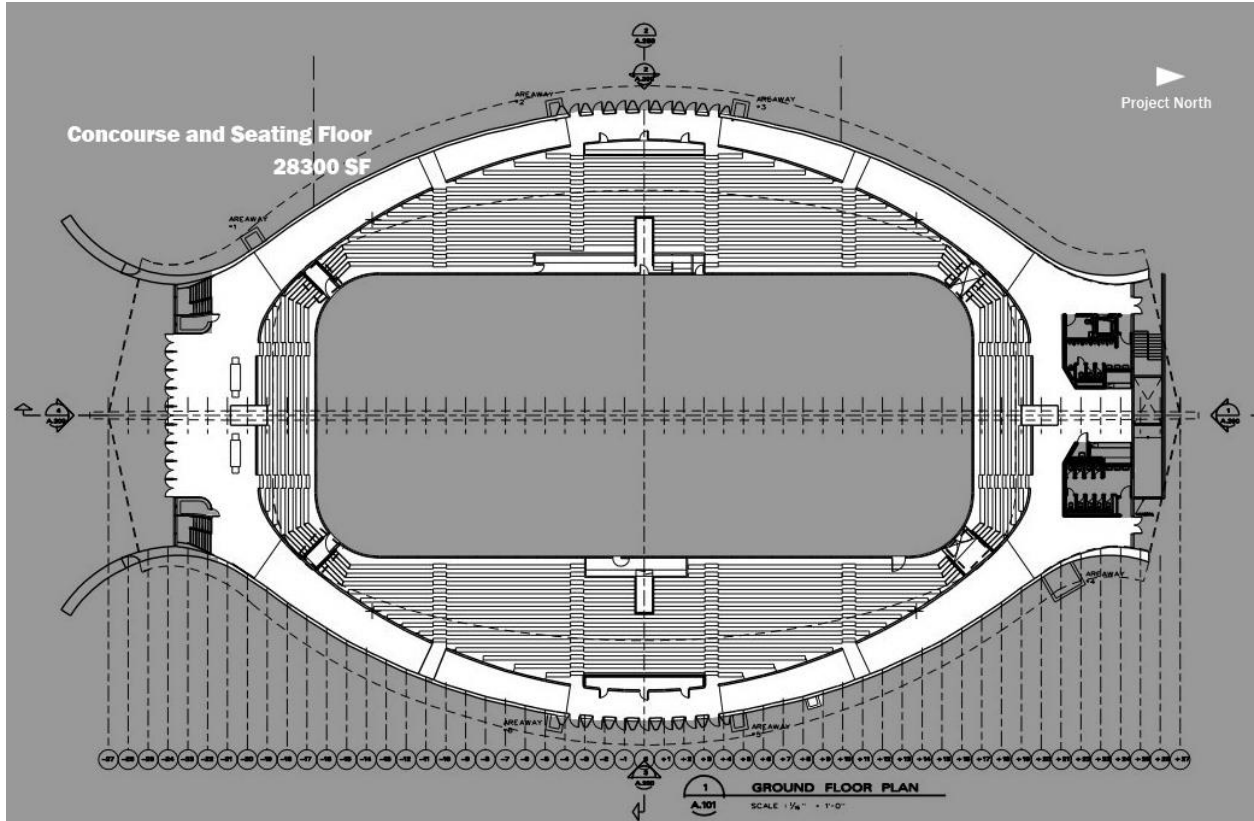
| Ground Floor Plan – Concourse and Seating Floor
